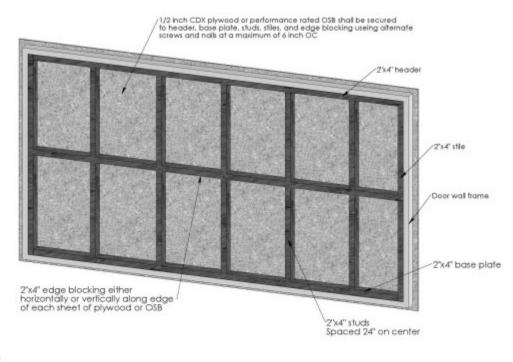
(1) BOARDING OF DOOR OR WINDOW
